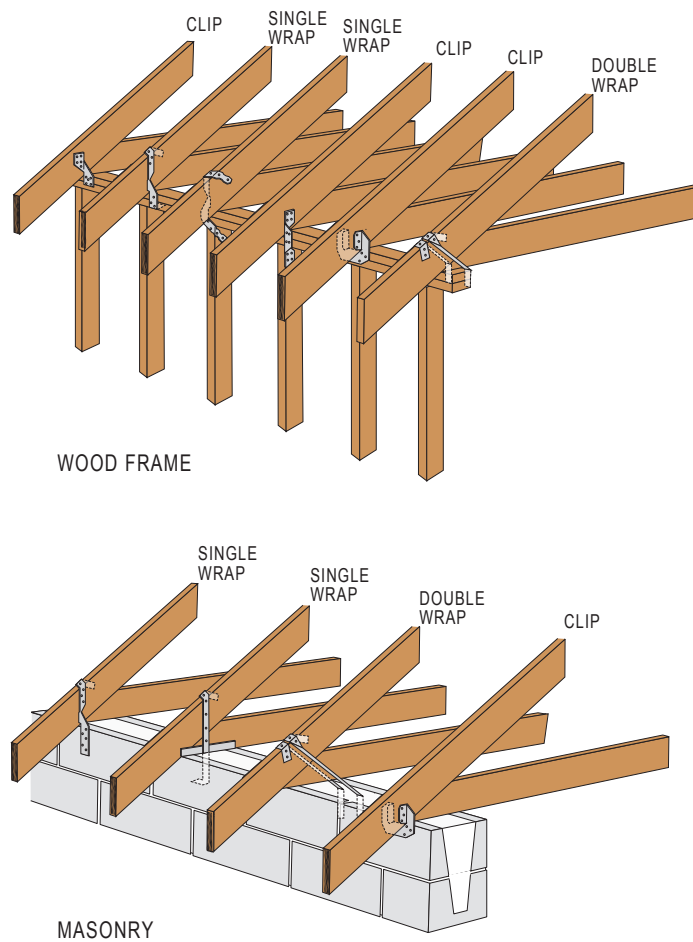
ROOF-TO-WALL SHEET METAL CONNECTOR TYPES
